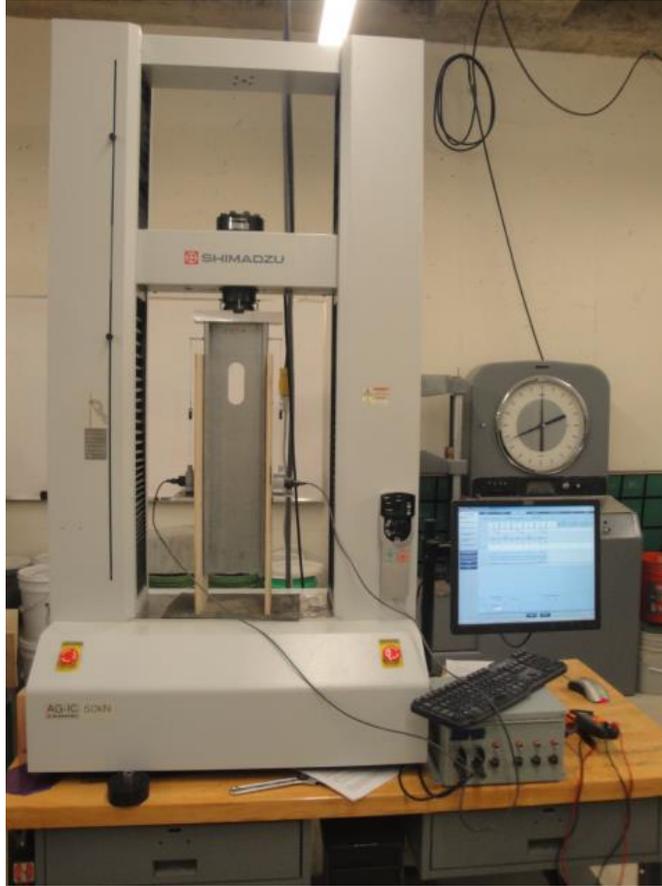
Test Specimen Setup for Varying Fastener Spacing
